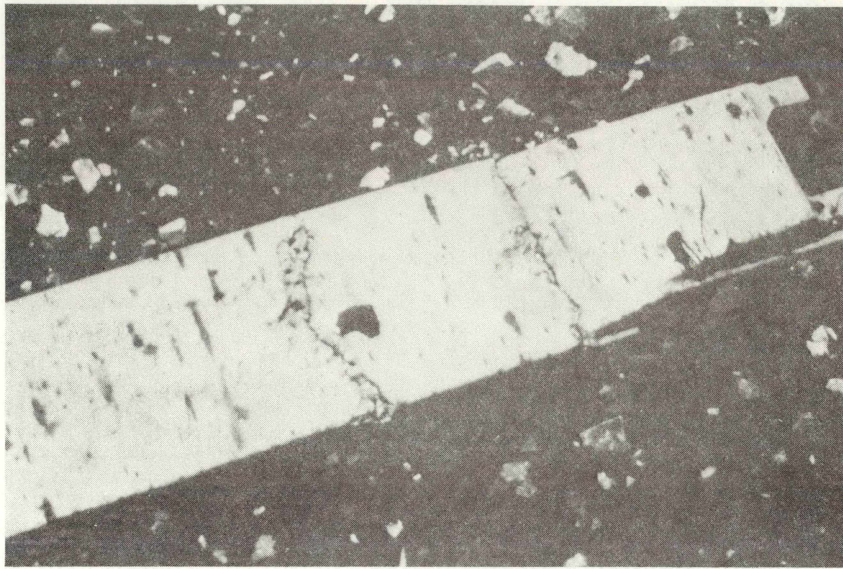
Tie Center Cracks - apparently due to center binding. Ballast is reported as volcanic cinders. (1)
